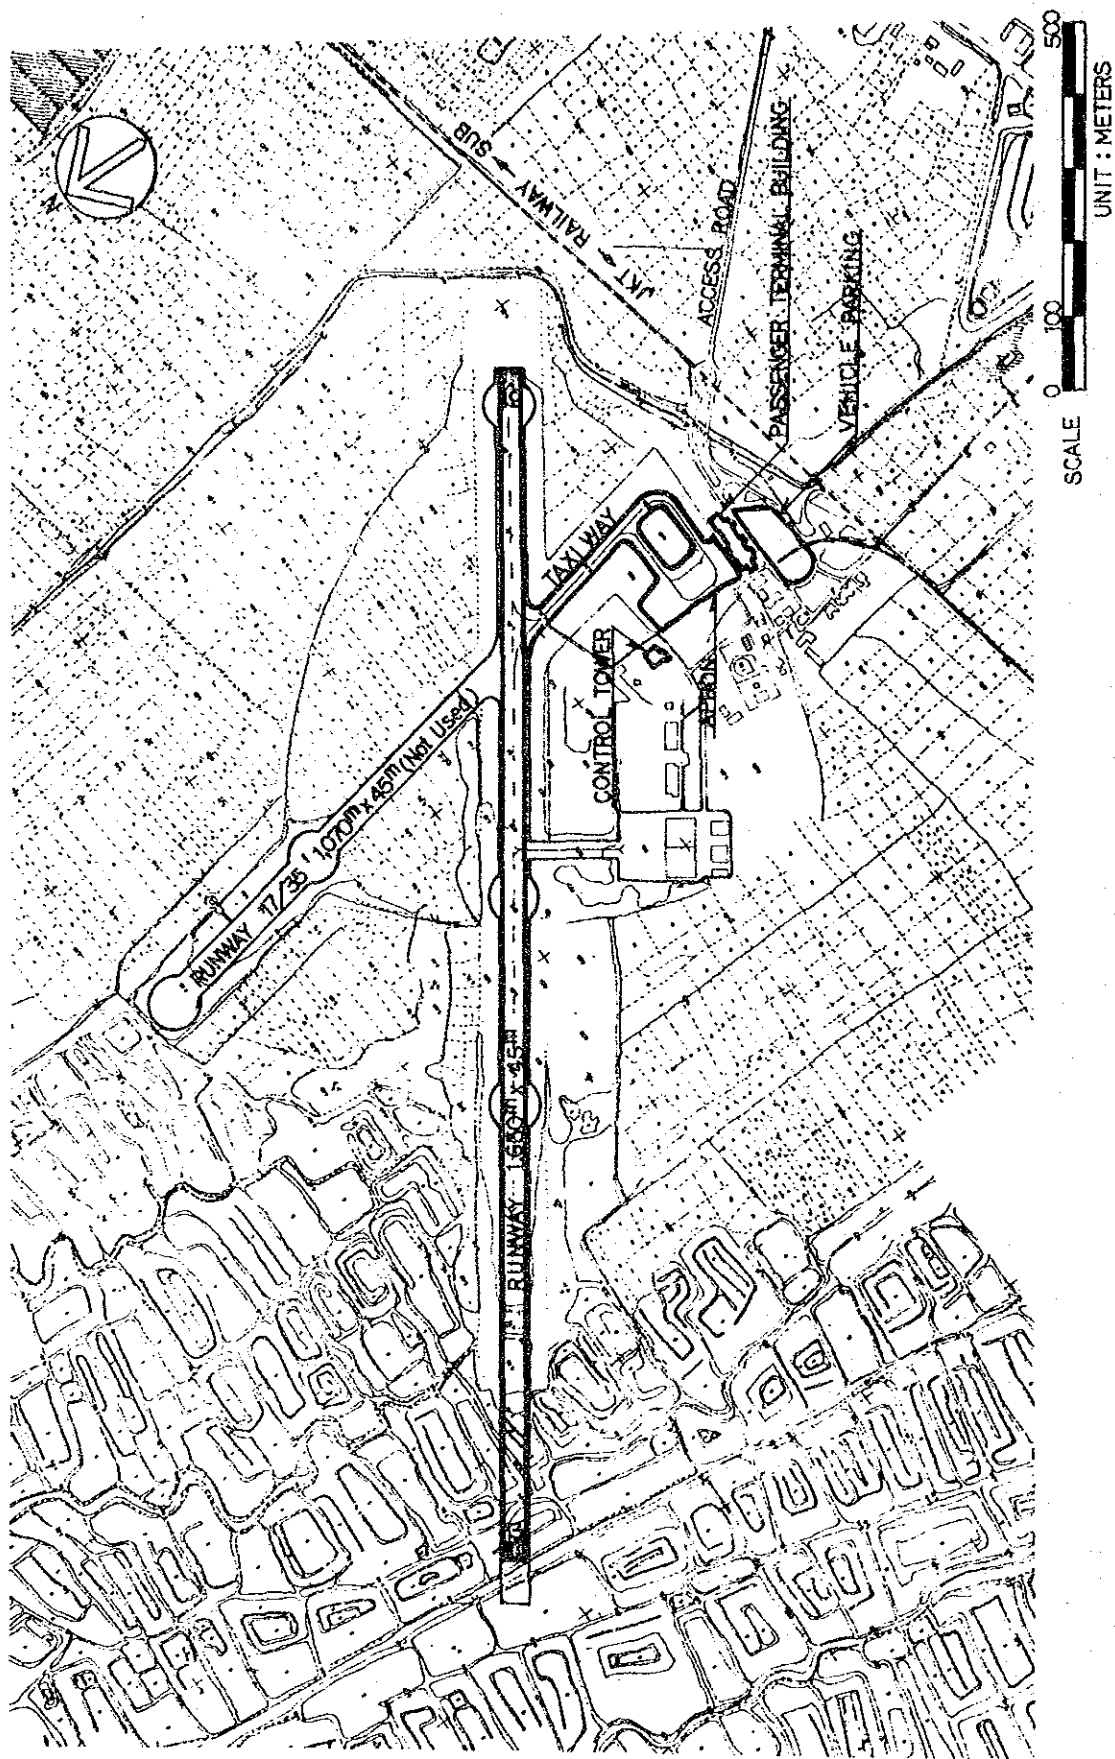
Layout Plan of the Existing Semarang Airport
